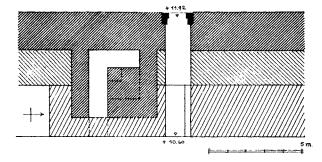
Tower and Small Gateway in the West Course of the Great Girdle Wall, Scale, 1:200
